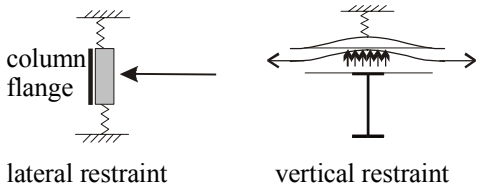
Confinement of the concrete bearing against the column flange
